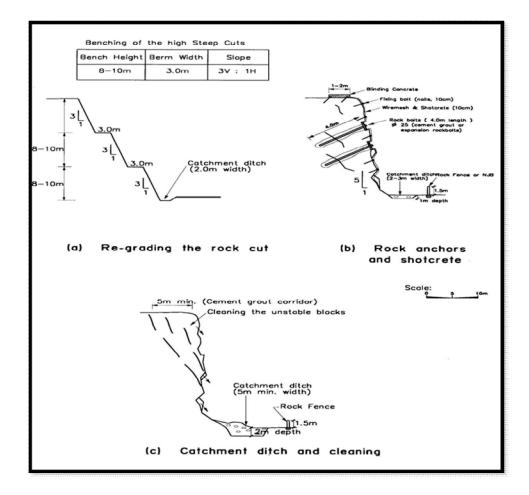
Proposed rock slope protection measures of the existing unstable cuts (a- benching and re-shape the vertical cuts, b-protection of free blocks with anchors and shotcrete and c- foot slope rock fall catchment ditch).
